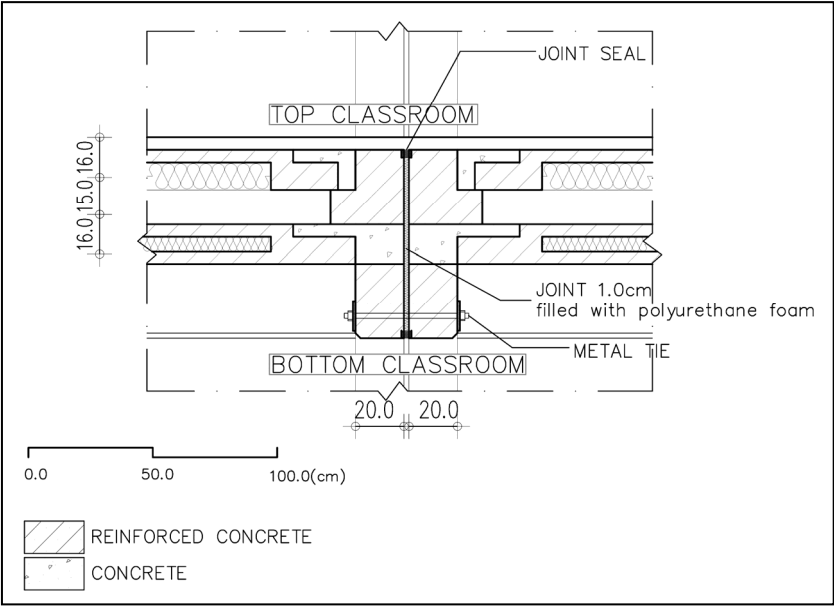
Drawing detail at the joint between prefabricated cells (“wrap around” joint within classroom).
